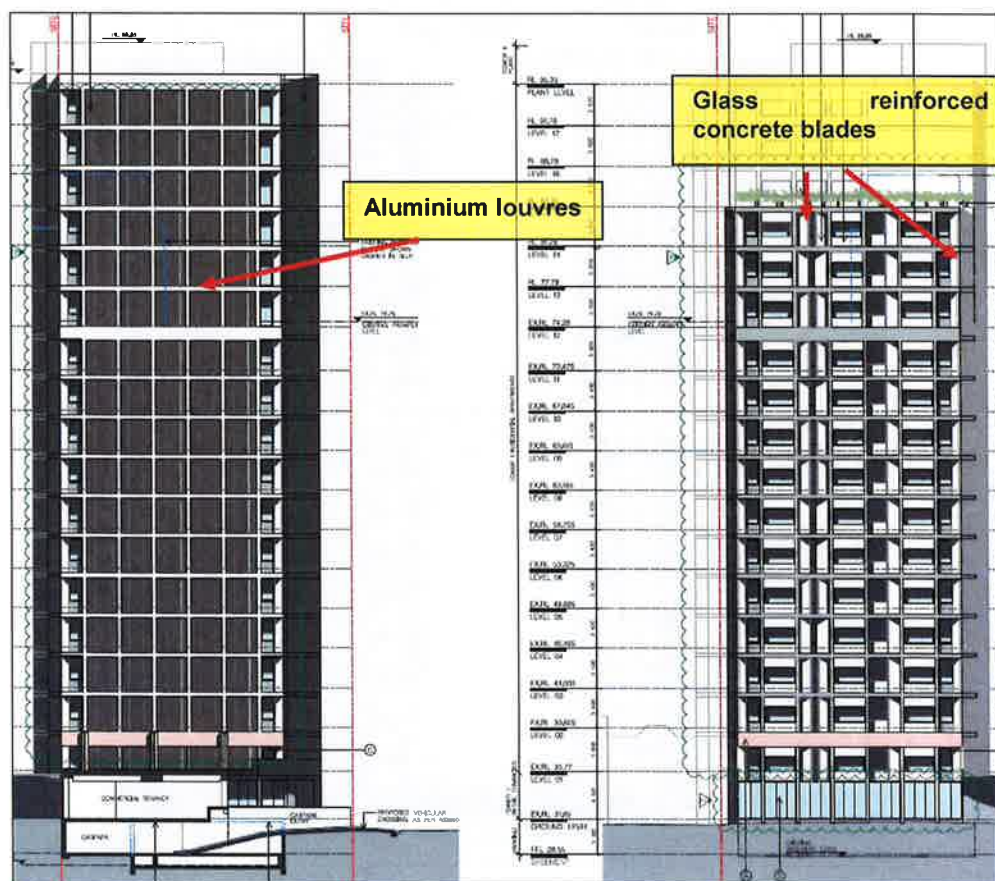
Proposed eastern and western elevation of Tower 1 (Source: Plans MOD 3)
